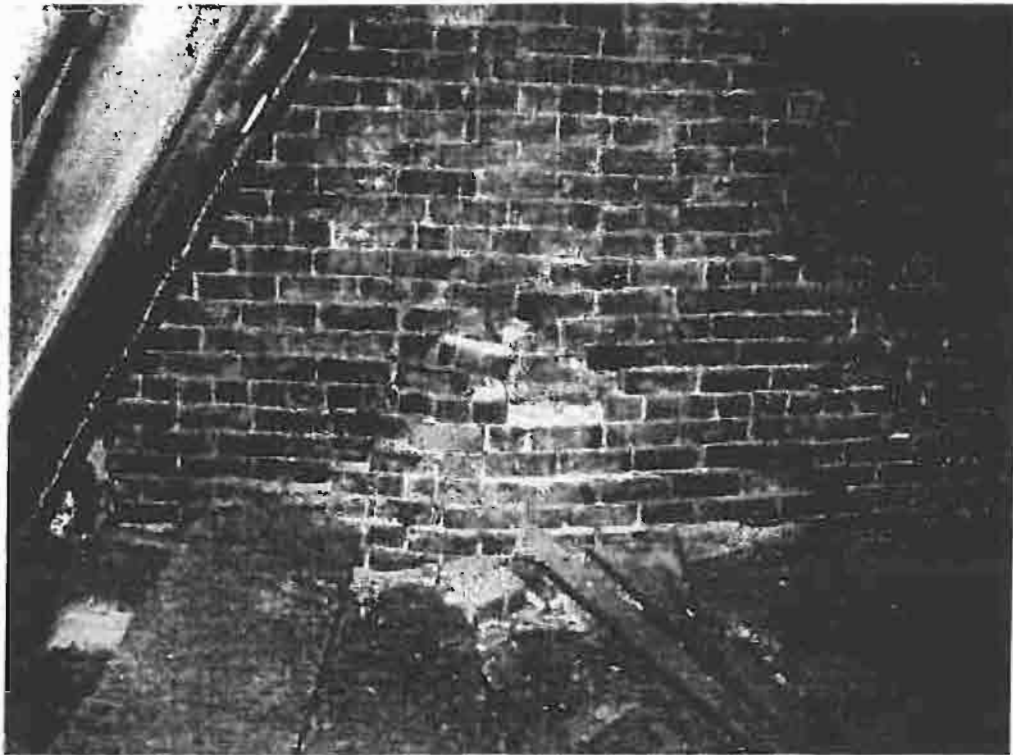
Upper East Wall. Brick Failure inside Attic Space.
